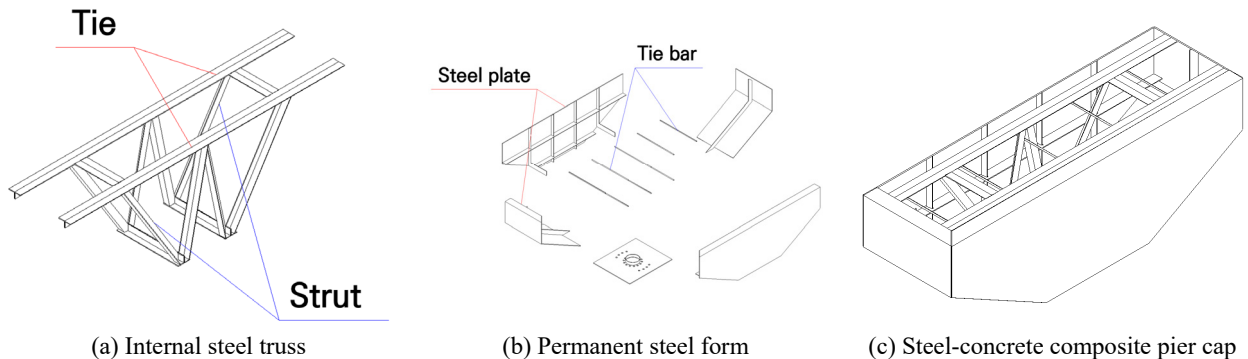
Structural configuration and components of the proposed steel-concrete composite pier cap
